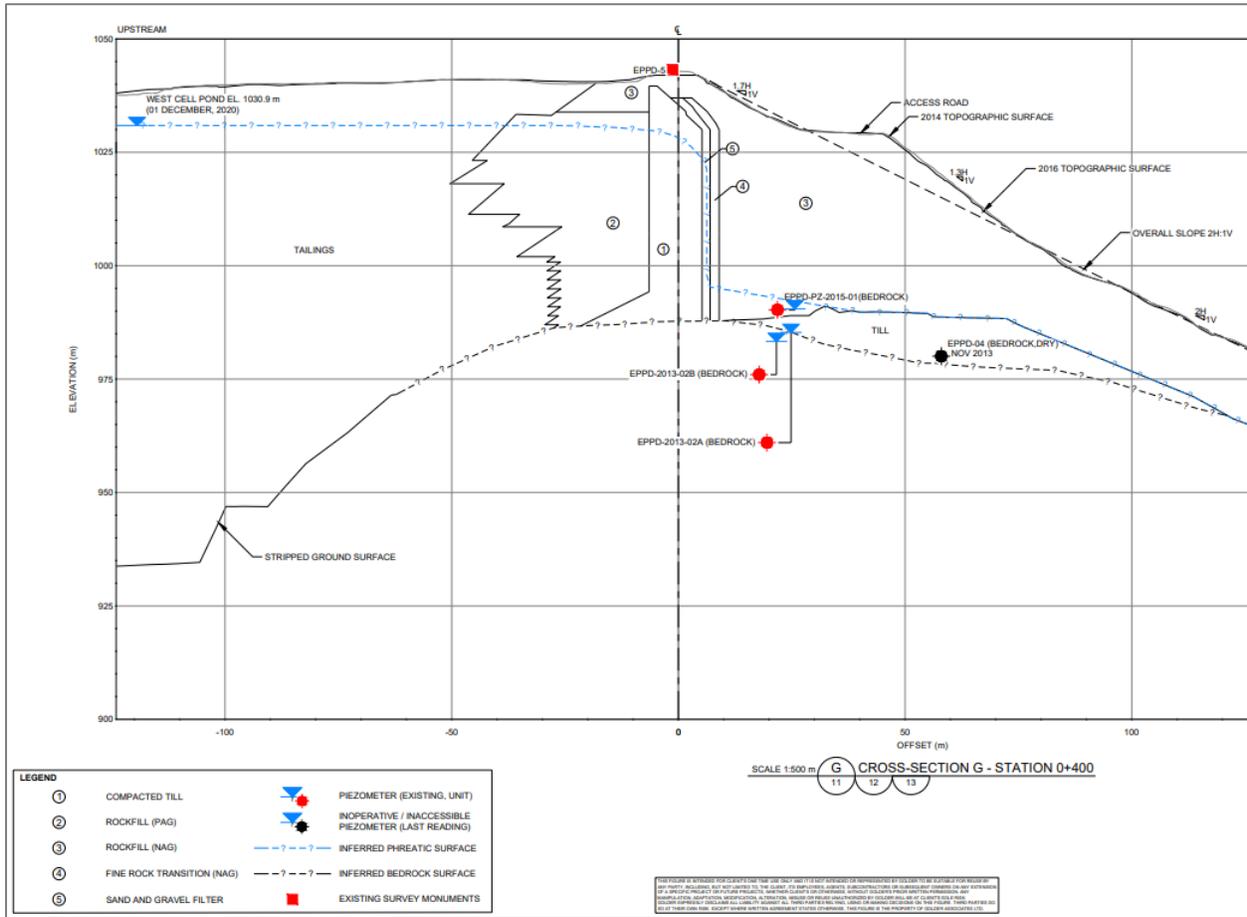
The East Pit Plug Dam at the Huckleberry mine site was constructed out of natural rockfill, natural earthfill, and mine waste rock. Based on the above cross-section, the dam was clearly raised using the centerline method (compare with Fig. 2c). Portion of figure from Golder Associates Ltd. (2021).
